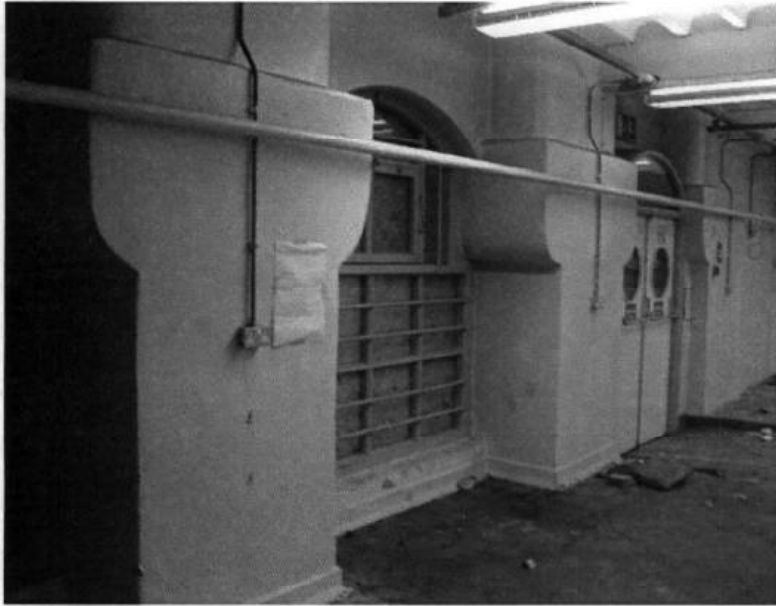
inside former boiler house, stone piers on north-west external wall (block B)
